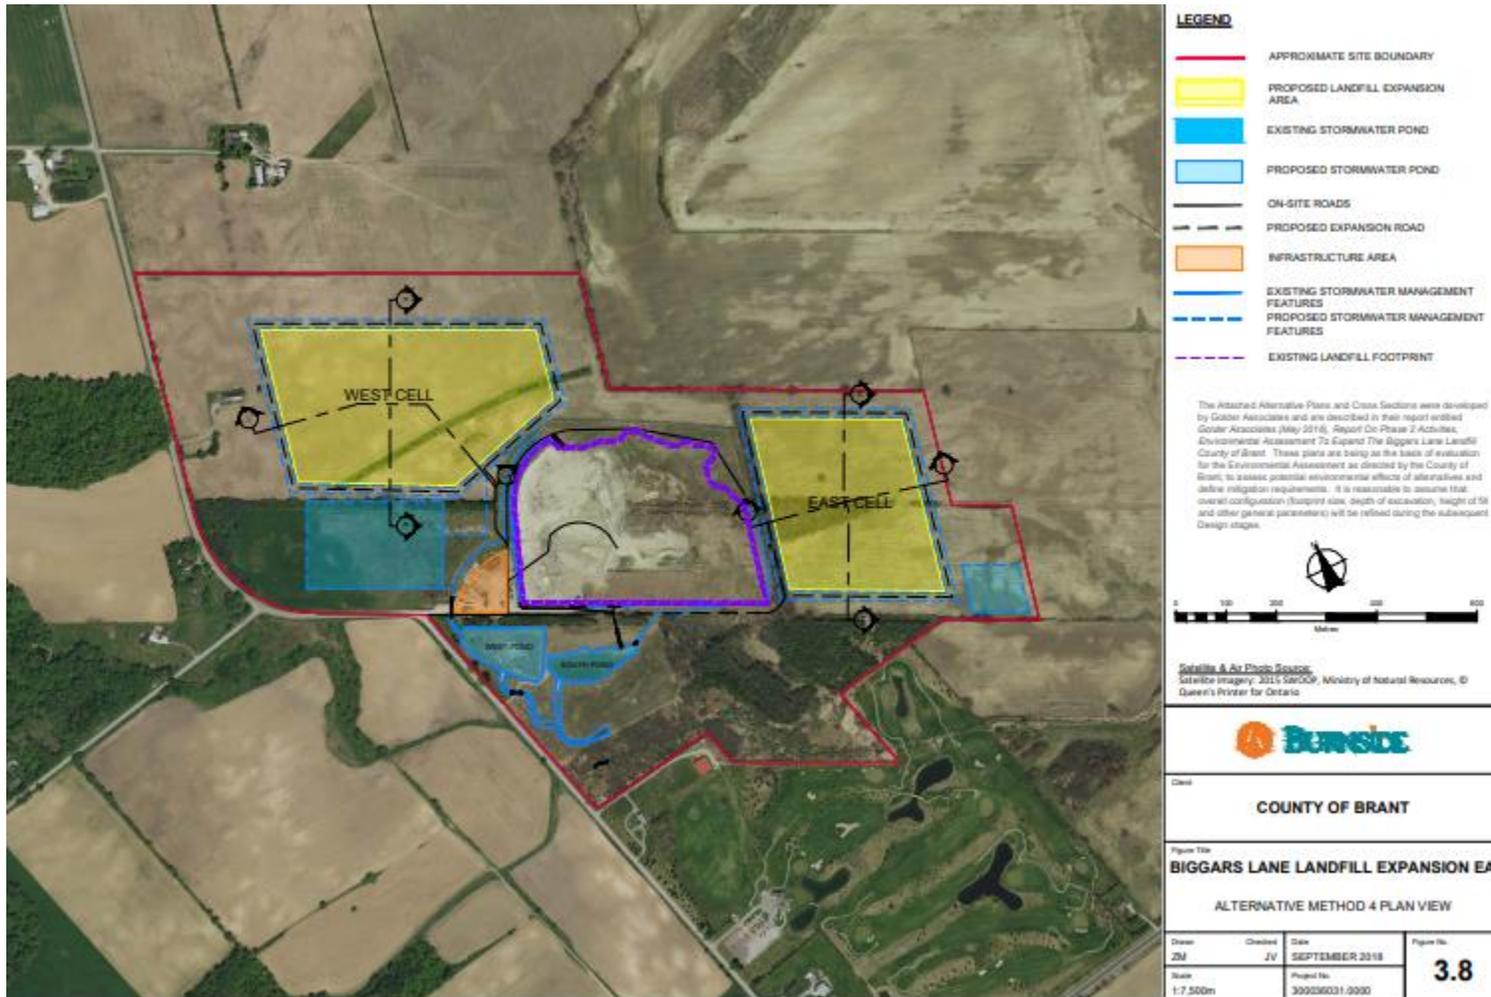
This figure shows Alternative 4 for the proposed layout of the landfill expansion including the locations of waste piles, stormwater ponds & on-site roads. Includes two separate landfill footprints, one 11.7 ha and one 8.2 ha, both using an engineered base containment design.
